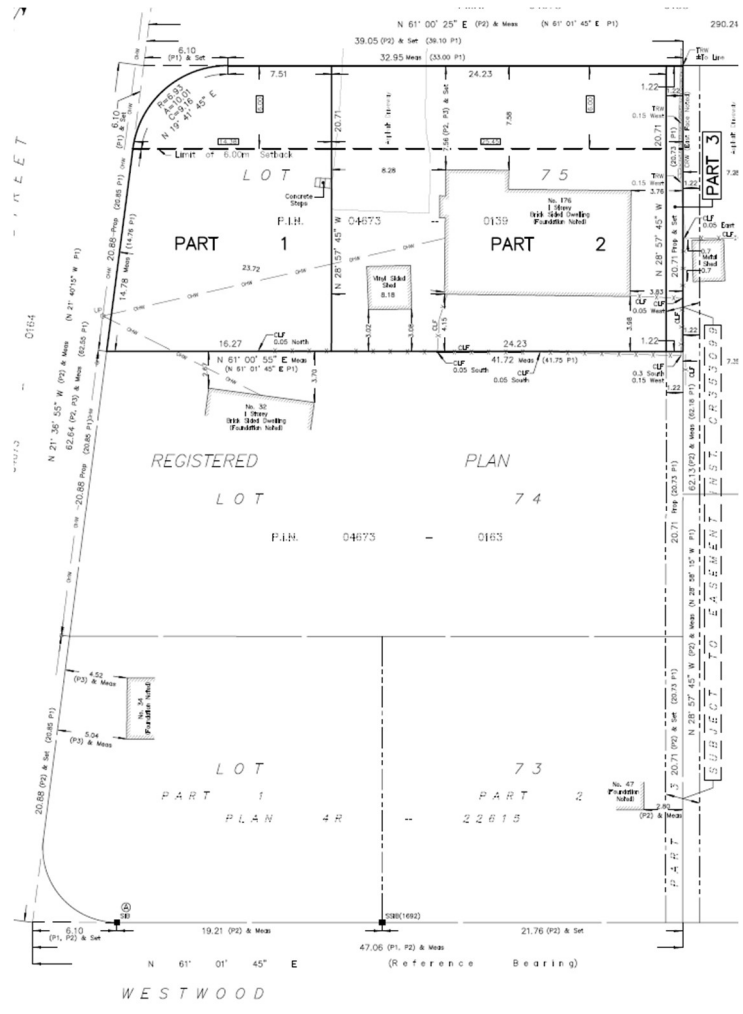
Similarity between proposed Lot 75 (South of Oakridge Blvd.) and Lot 73 (North of Westwood Drive)
